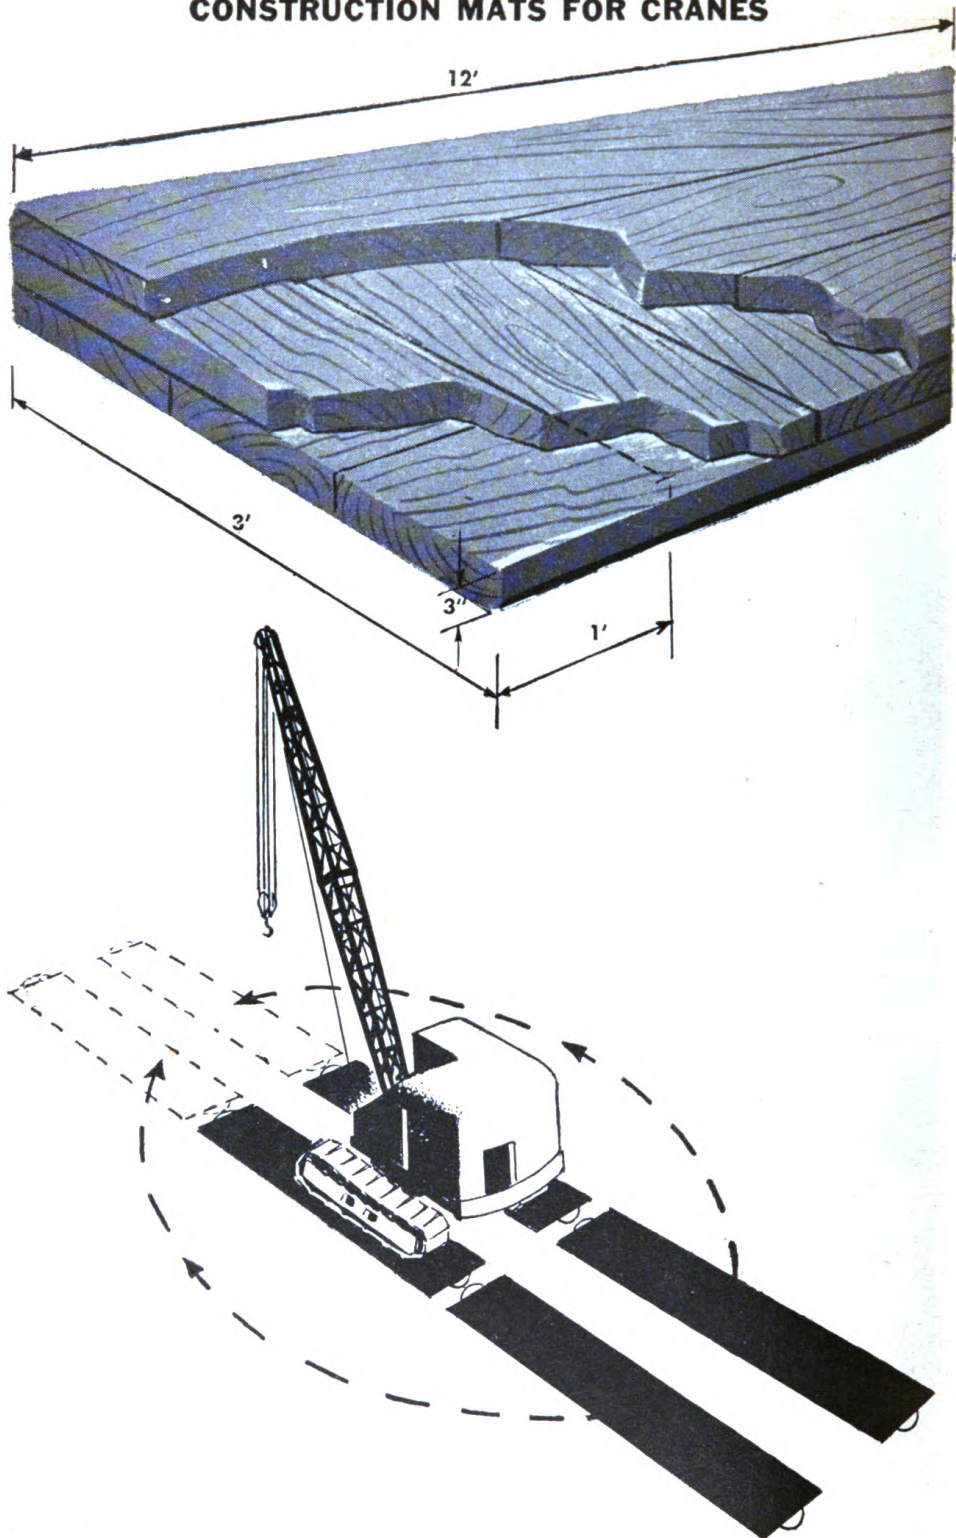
Construction mats used to facilitate crane travel in muddy or swampy terrain.
